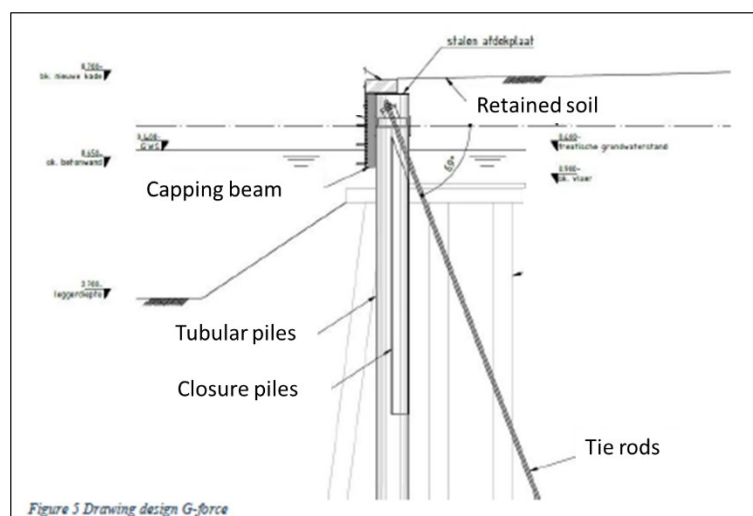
Section of the remedial works proposed to the quay wall showing tubular piles and inclined tie rods and small diameter closure piles
